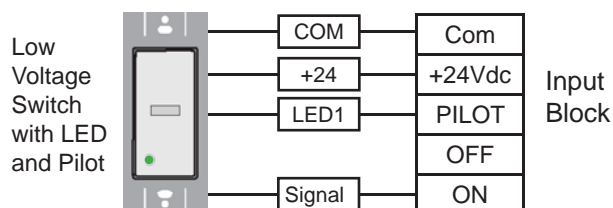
Typical LV Switch 1 Btn with Locator Connections
